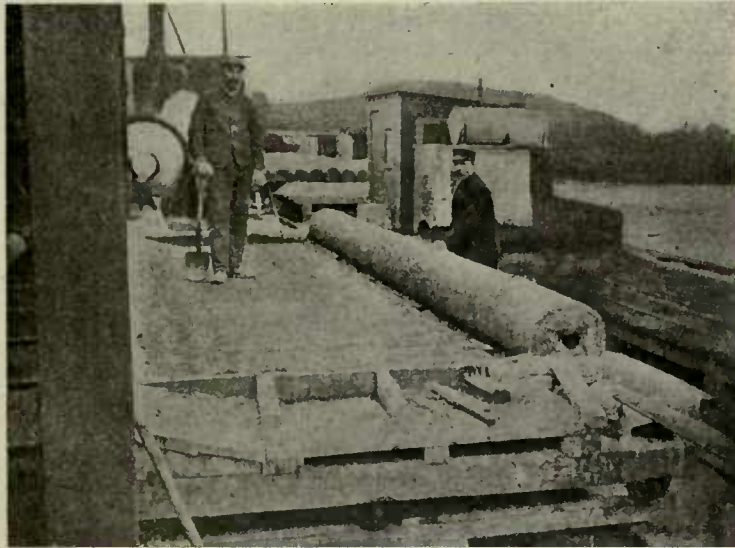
ROLLED CONCRETE PILE NEARLY COMPLETED.
